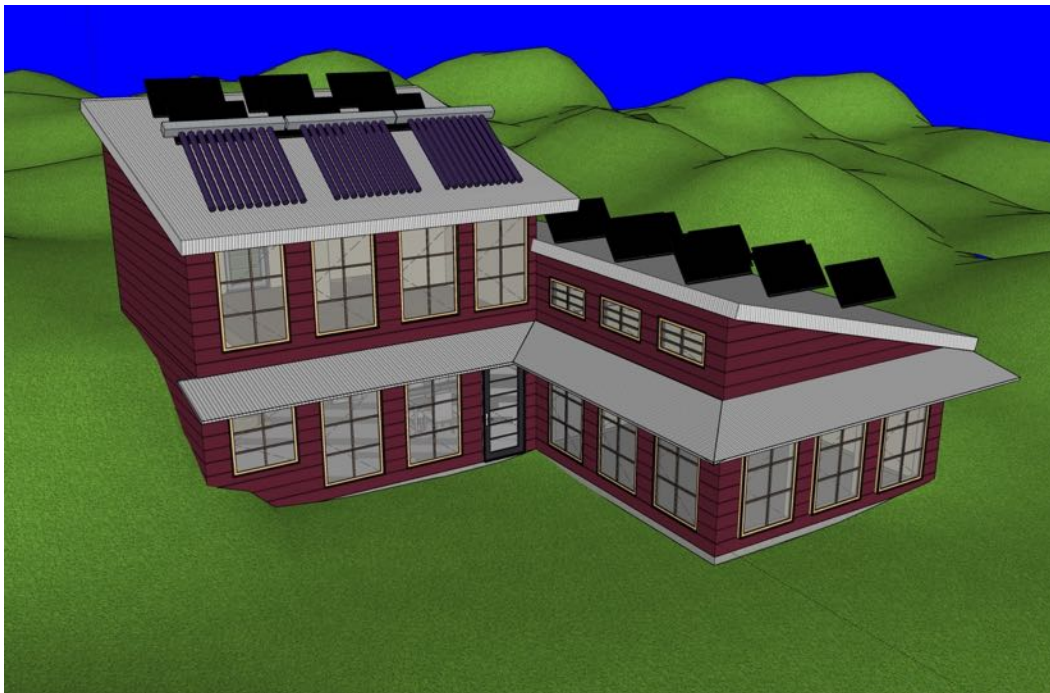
3-D Model of the house. The entire back wall of the first floor is buried.
